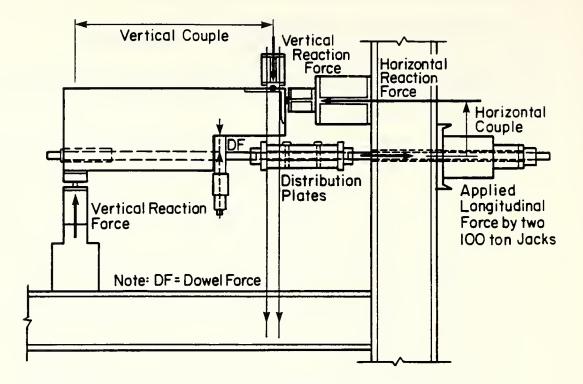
Modified Cantilever Beam Stub (Kemp).
